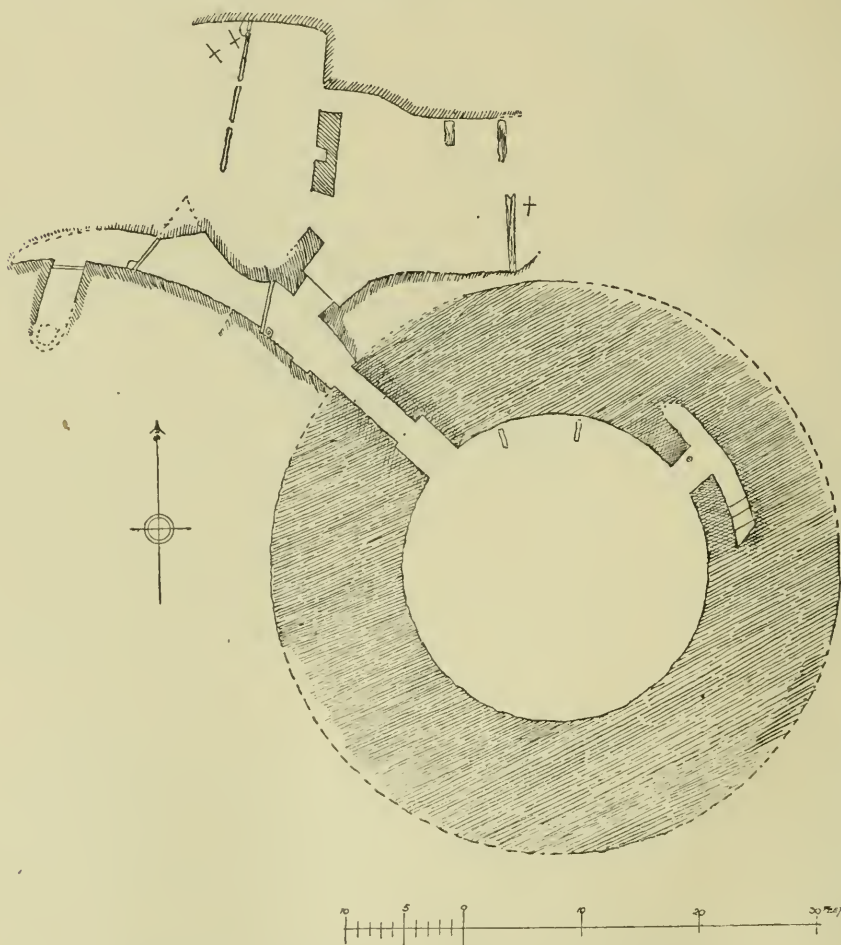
"Norwall Broch" (No. 508); Ground-plan.
